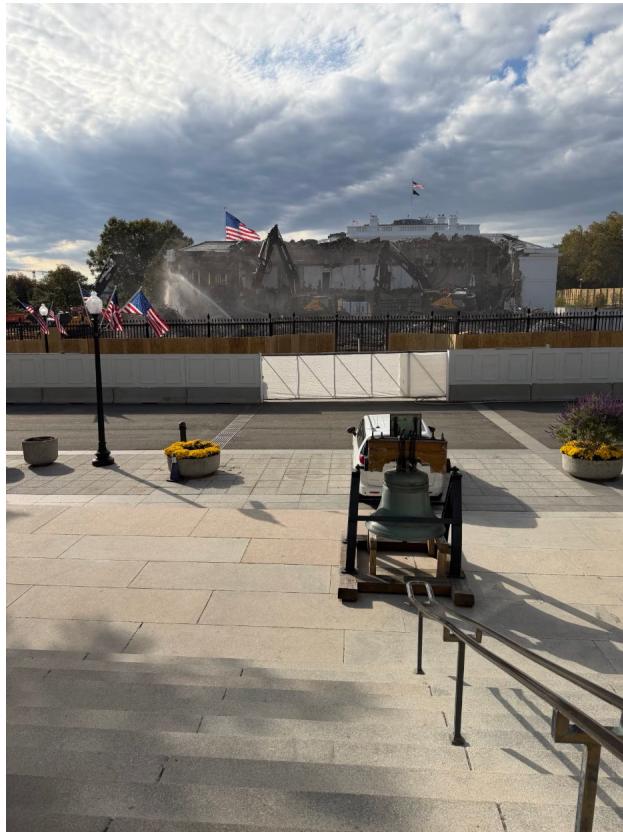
View from the White House toward the North Lawn and Executive Avenue showing early demolition activity and tree removal at the former East Wing site. The Washington Post.
